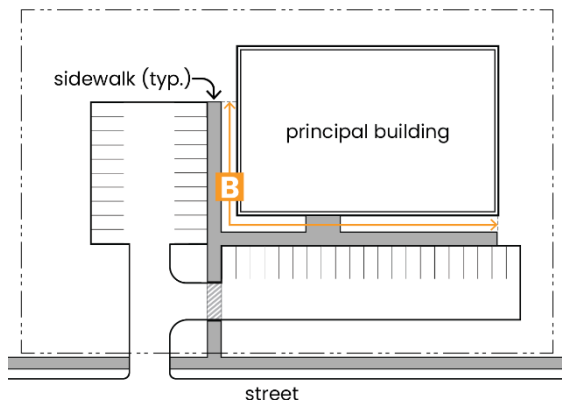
A pedestrian crosswalk in the parking lot of a fast-food restaurant
